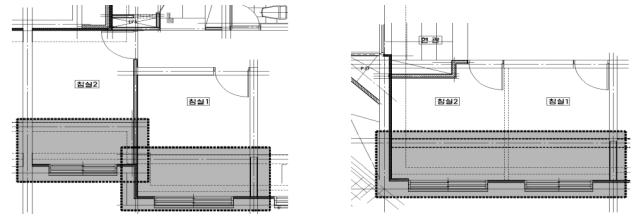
Plan after expansion of bedroom1,2 front balcony
